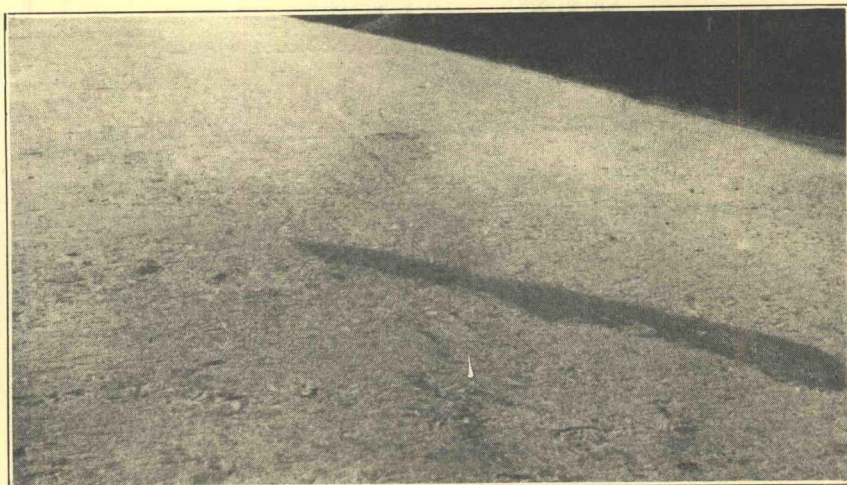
Plain and reinforced sections Station 252+00—Road No. 1066
